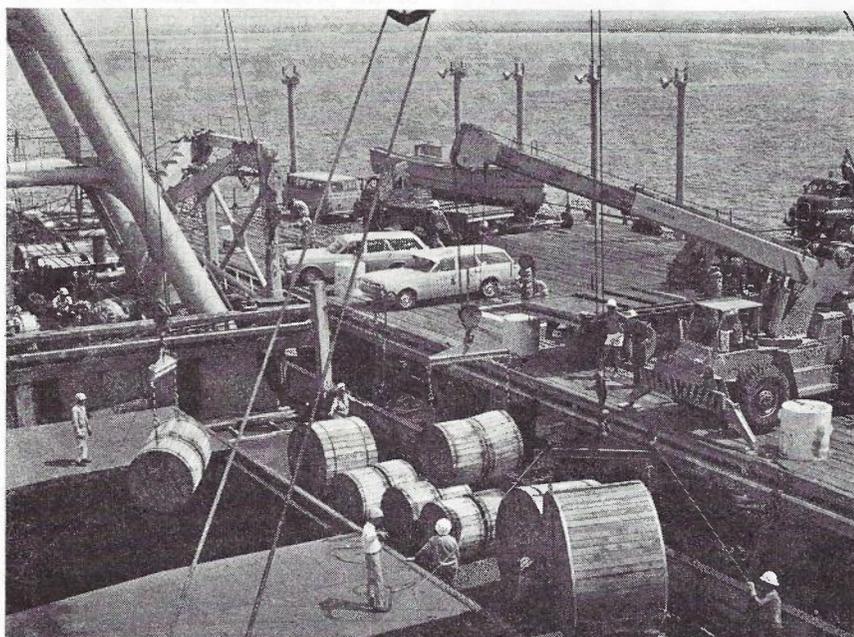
The U.S. Navy "Cherry Picker" Unloading Cable at Exmouth. Illustrating the Preferred Type of Crane.
